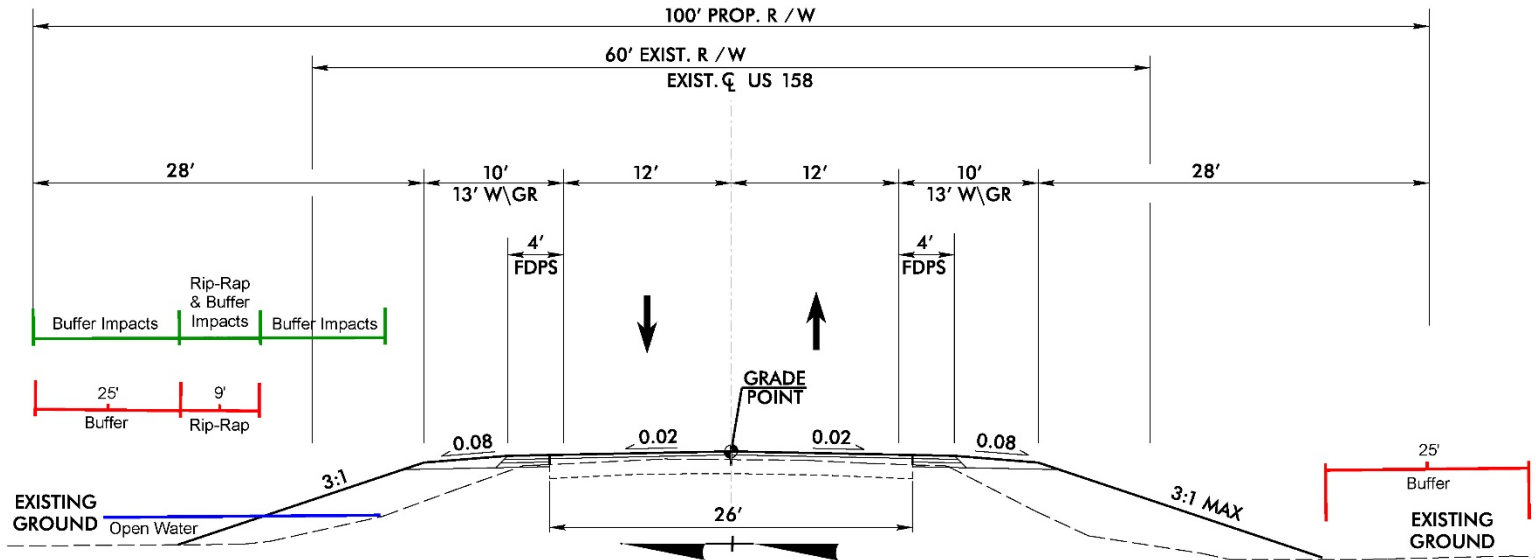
Alternative 3 Proposed Typical Section West of the Refuge
